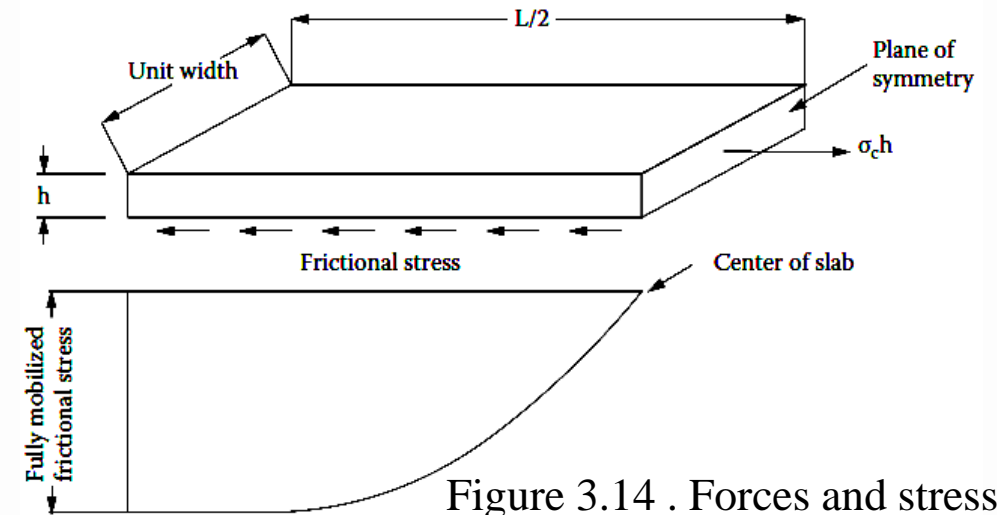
Forces and stresses due to friction in a concrete slab.
